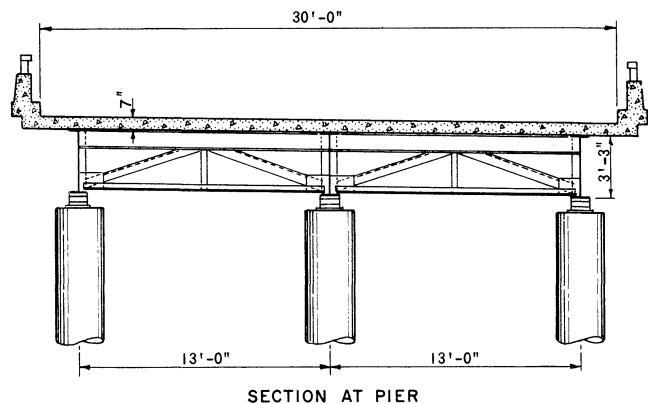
Section through the deck at pier. Stringers shown are plate girders with cross-frames at 15 ft-0 in. centers. On WF stringers, simple WF diaphragms are used.
